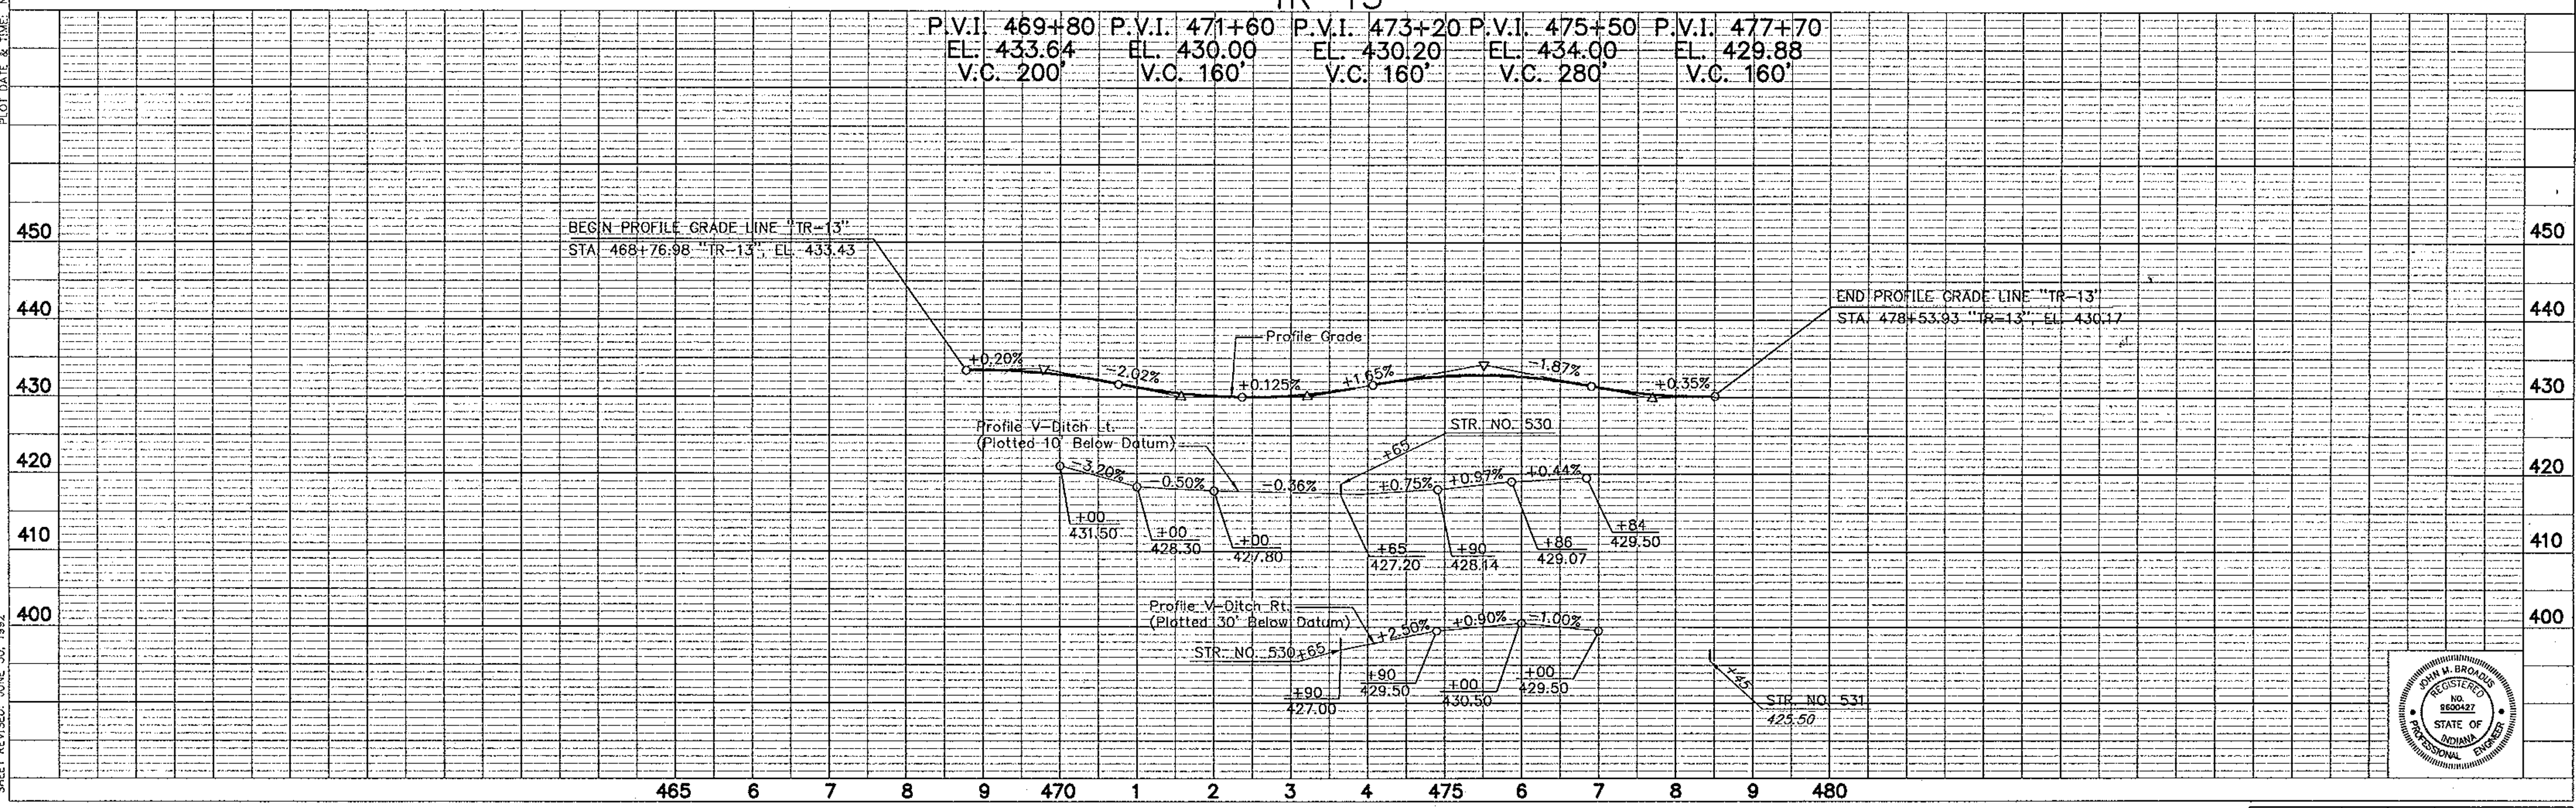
PLAN - PROFILE D. R. R. STANDARD 1975
